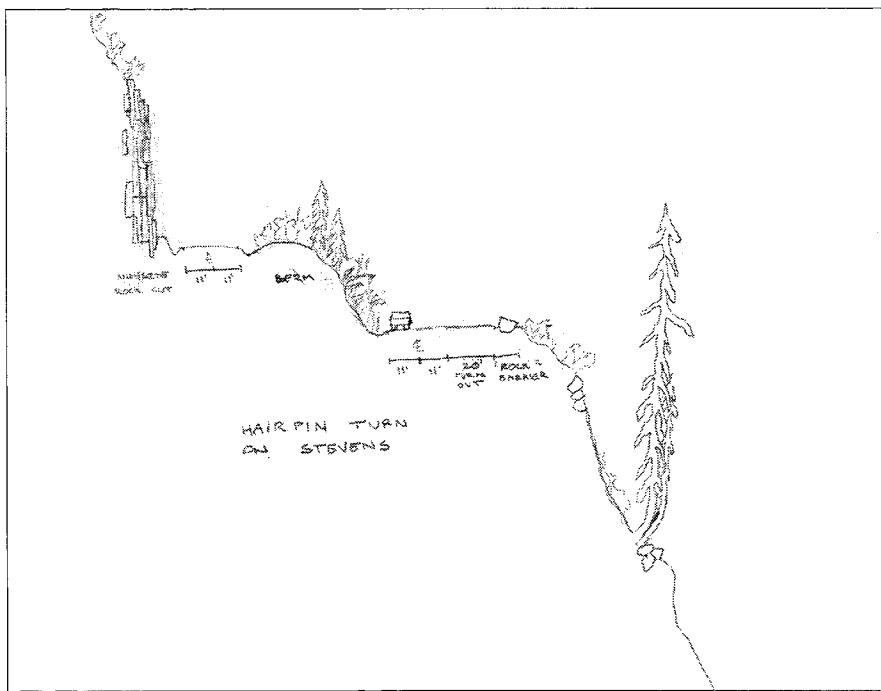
Contemporary sketch showing typical cross section on north side of Stevens Canyon, near bench lake hairpin curve (MORA 2004).
